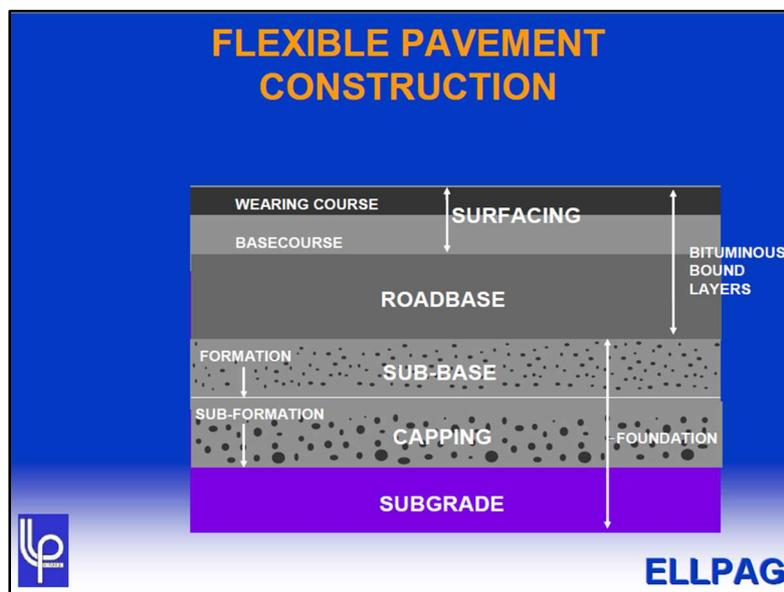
Flexible pavement construction (ELLPAG, 2006)
